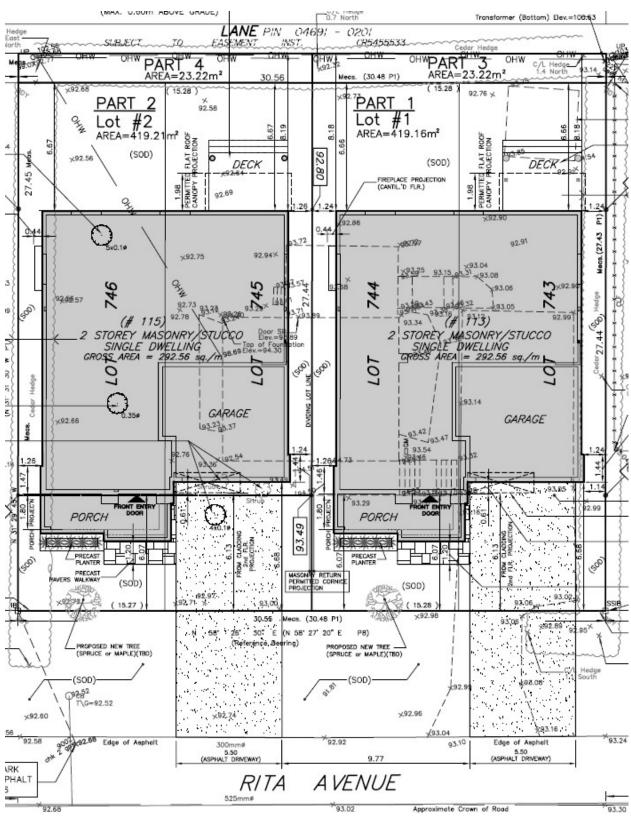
Exhibit K: Excerpt from Proposed Site Plan for the Subject Property
